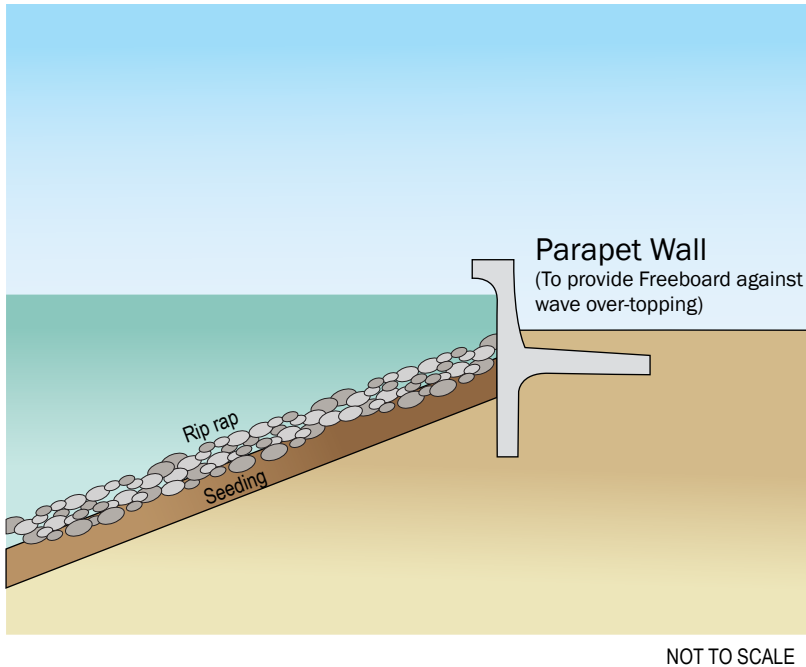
A parapet wall can give additional freeboard to protect against wave overtopping. (Source: USACE, 2004)
